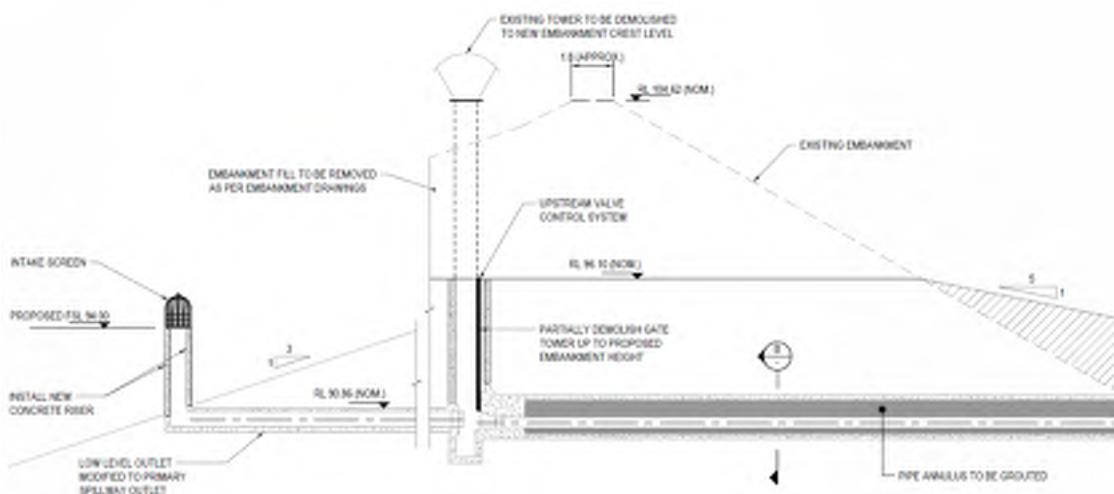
Typical section for Low Level Outlet and Tower modifications – Option 1D
